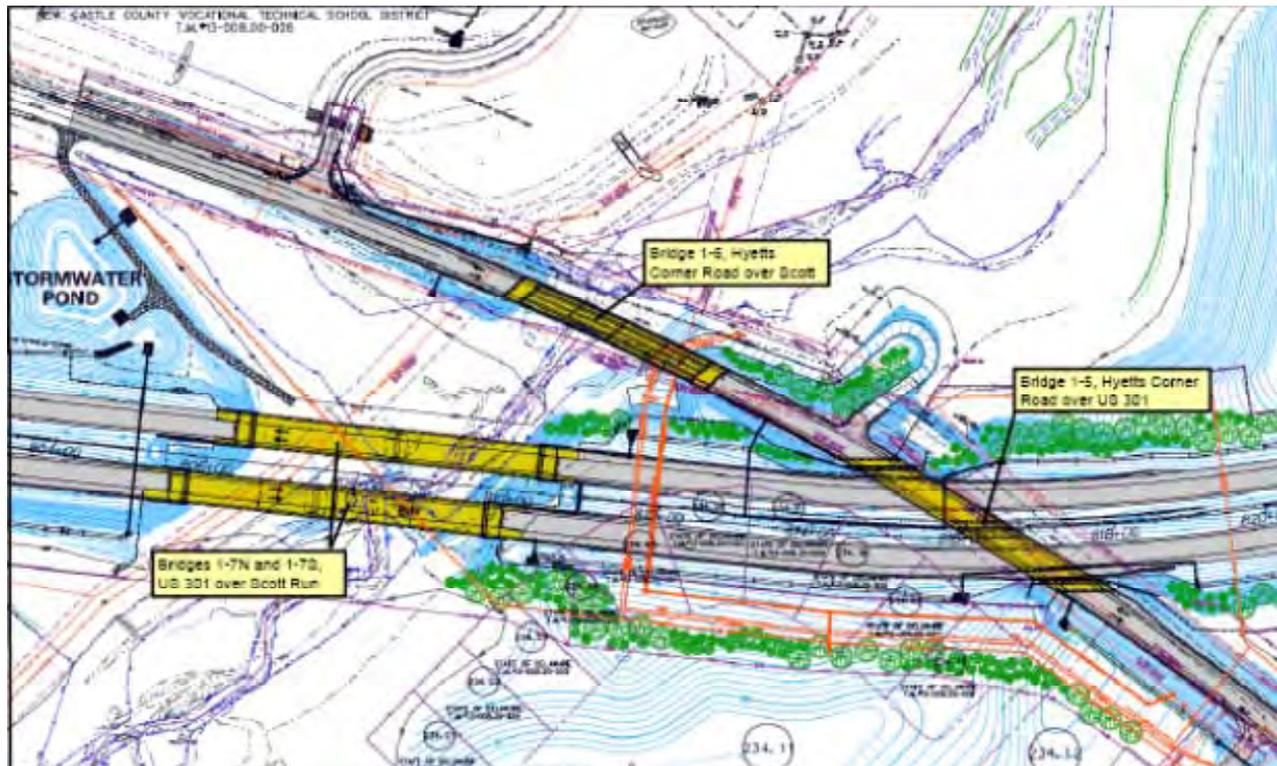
Design Refinement 4- Modification of Bridges 1-5, Hyetts Corner Road over US 301, and Bridges 1-6 and 1-7, Hyetts Corner Road and US 301 over Scott Run
